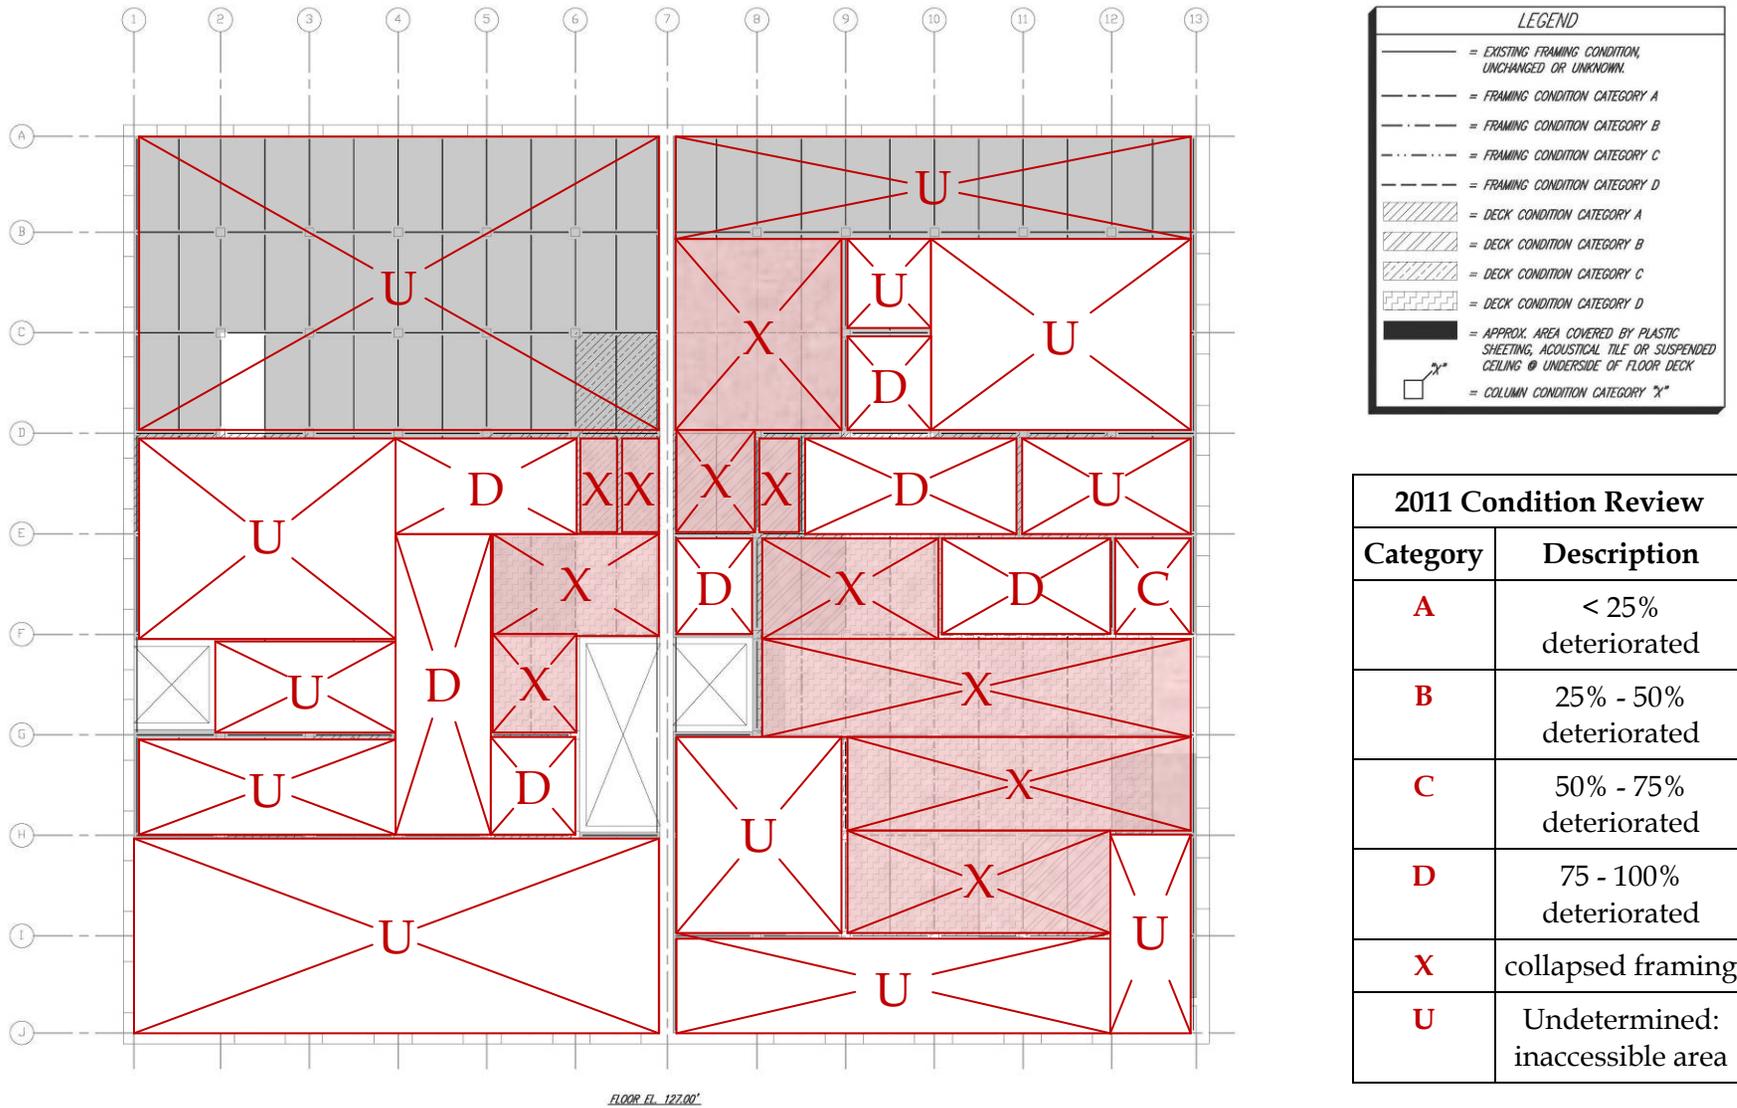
Third Floor Framing Plan - 2000 and 2011 (red)
